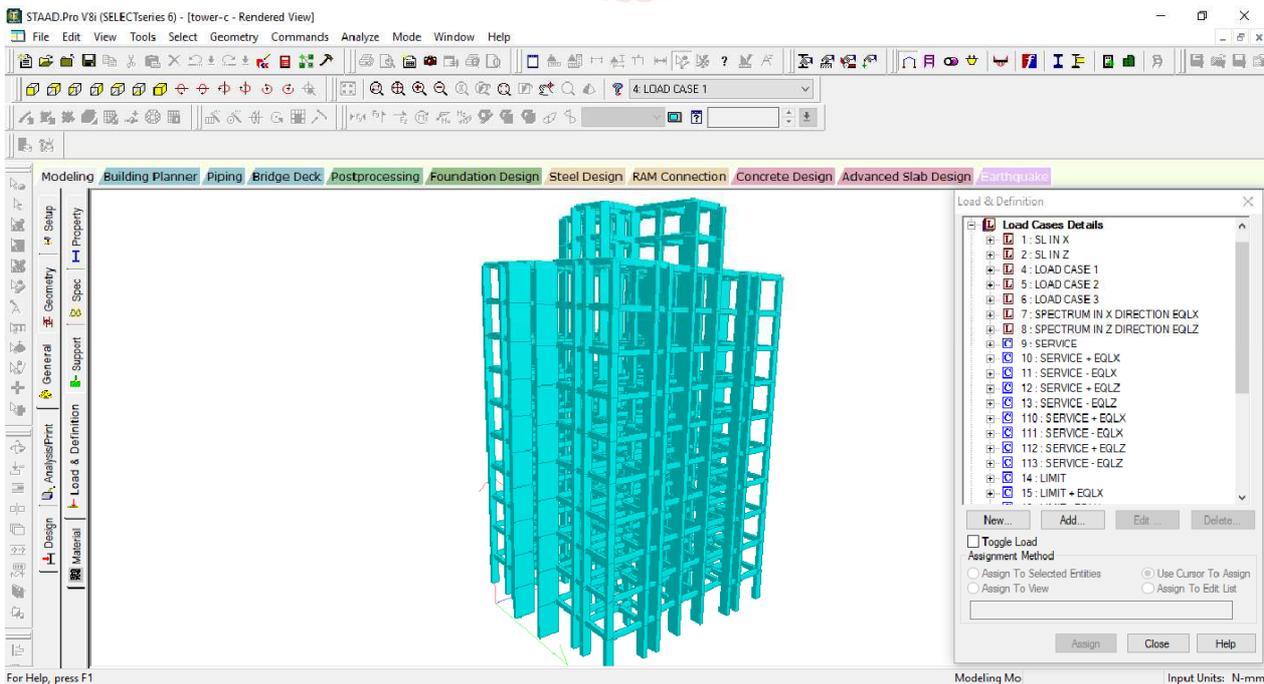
STAAD Generated 3D Rendered model of building without shear wall and floating columns
